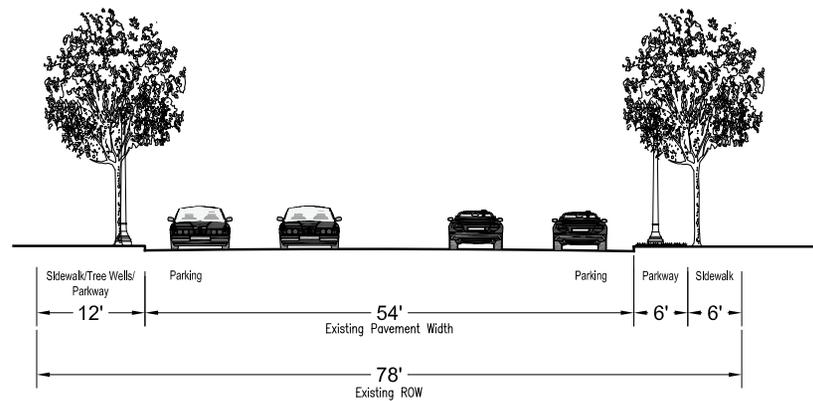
TYPICAL SECTION - RESIDENTIAL
